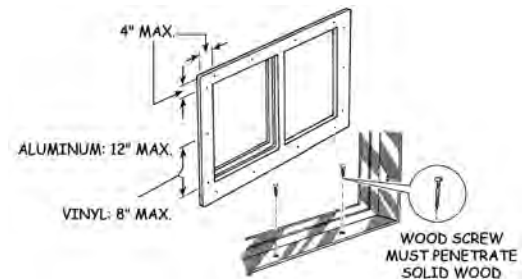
EXTERIOR STORM WINDOW ATTACHMENT
